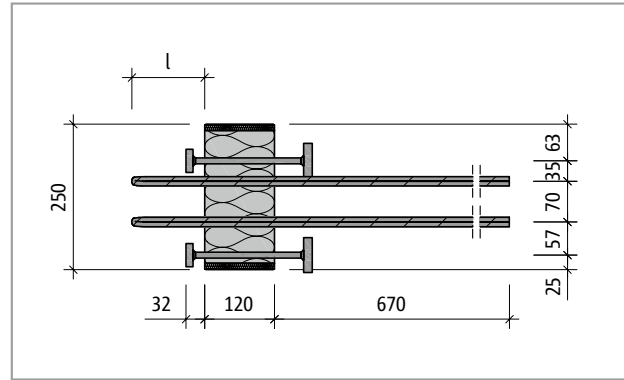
Schöck Isokorb® XT type O: Product plan view
